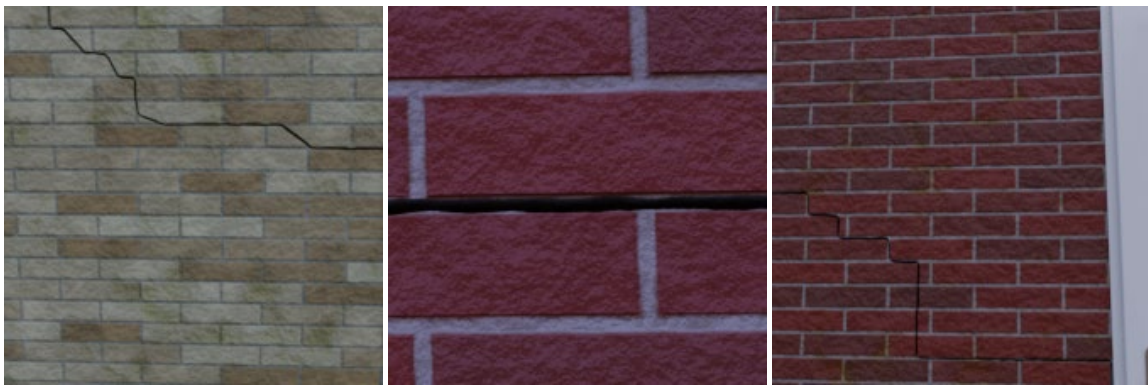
Examples of artificially generated cracked masonry walls.
